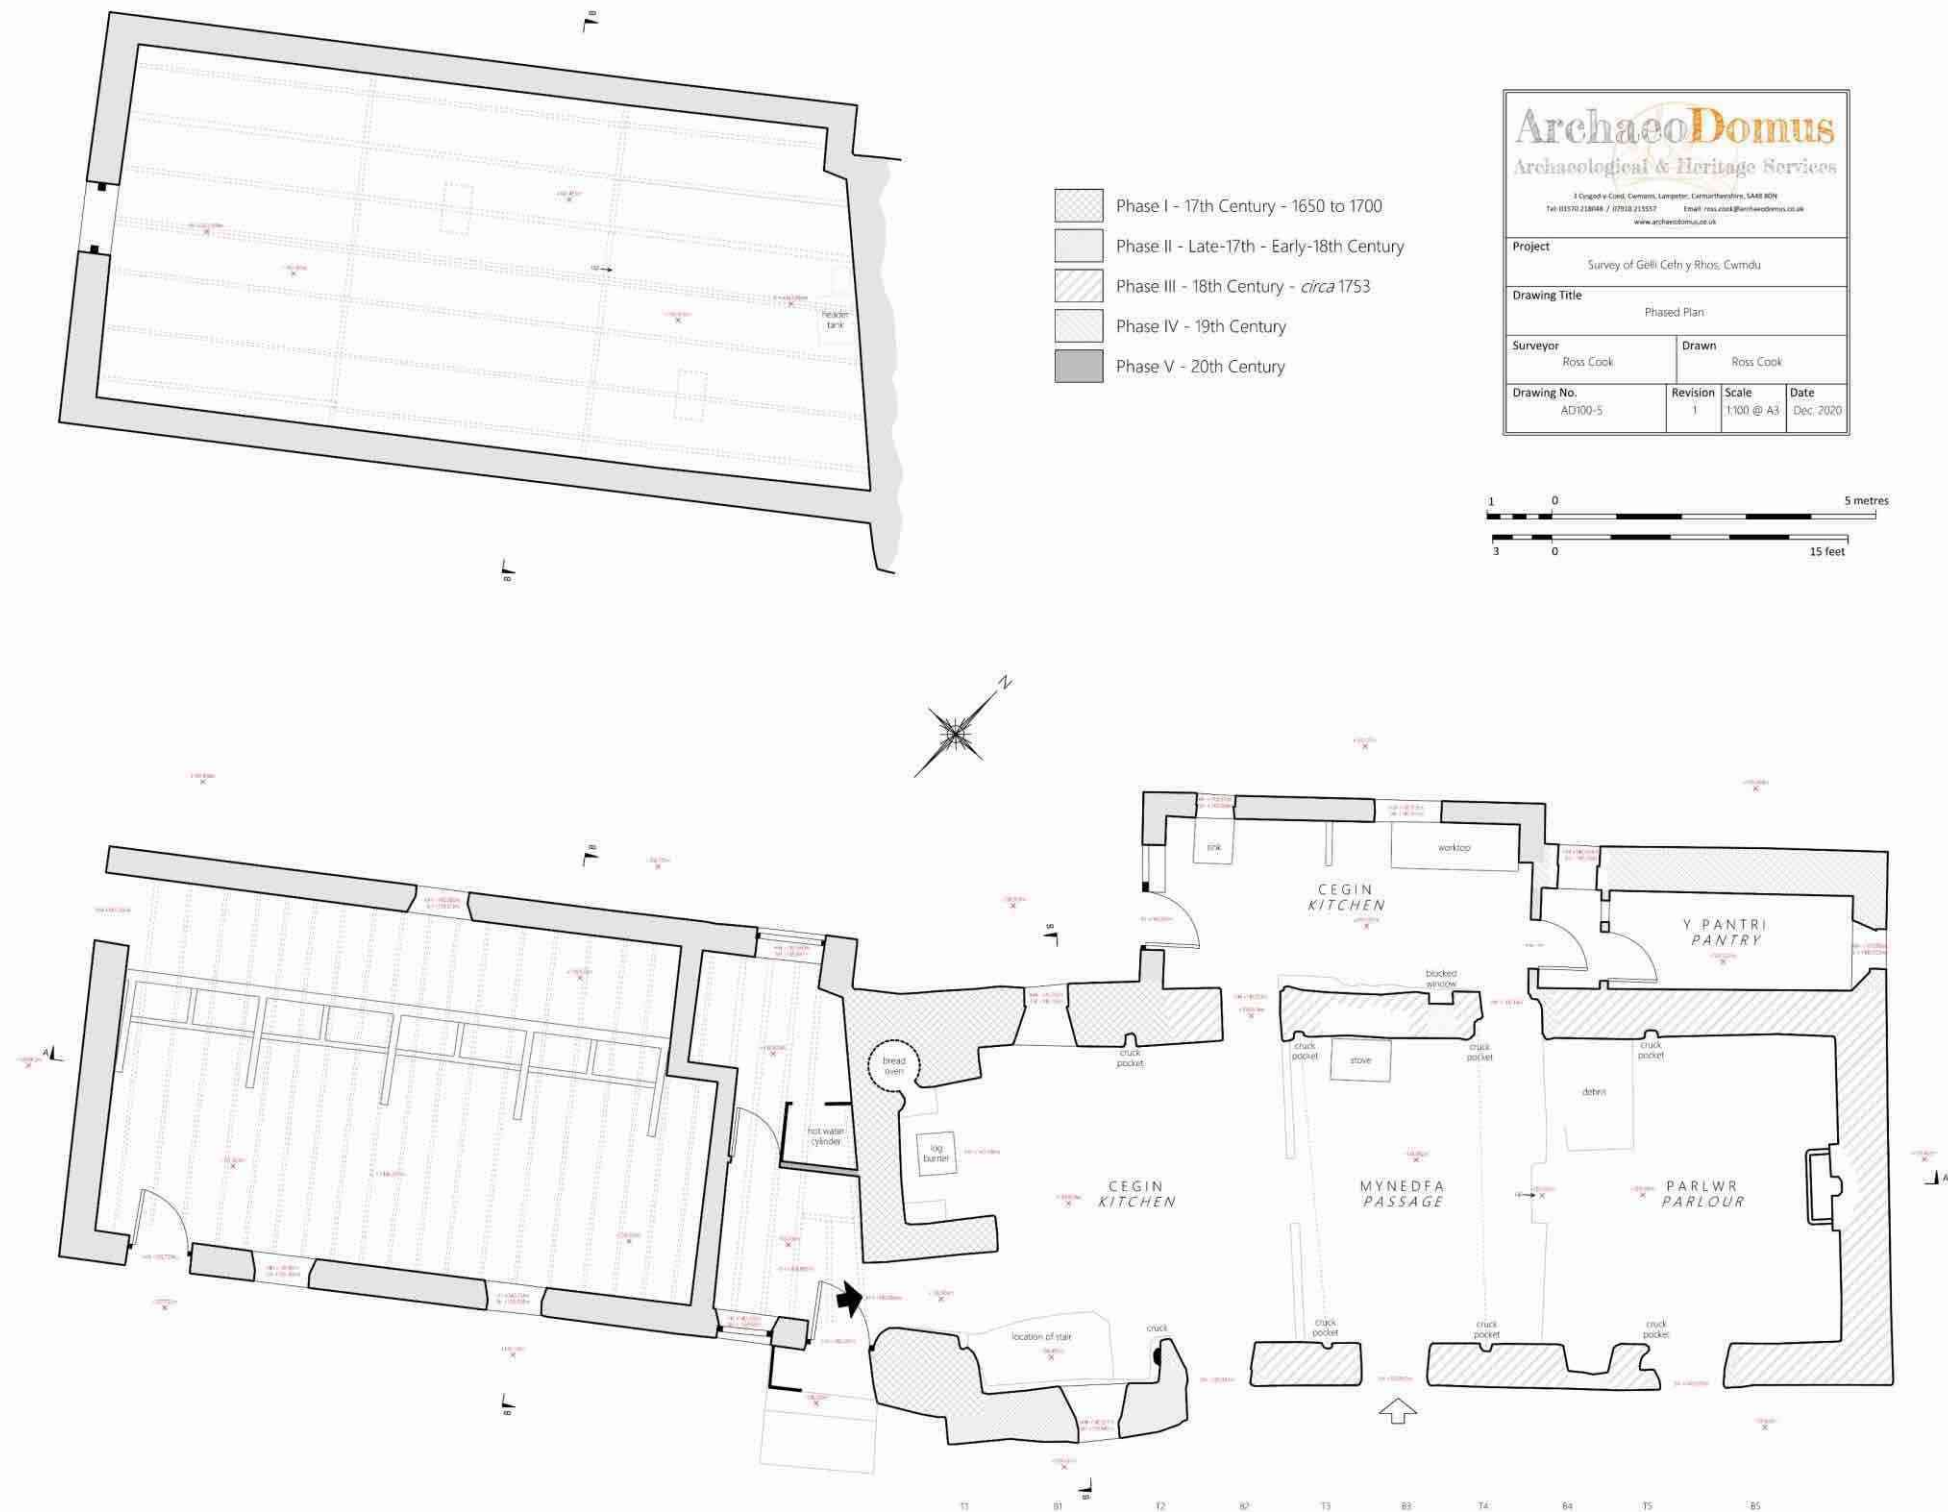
Floor Plans of Gelli Cefn y Rhos.
